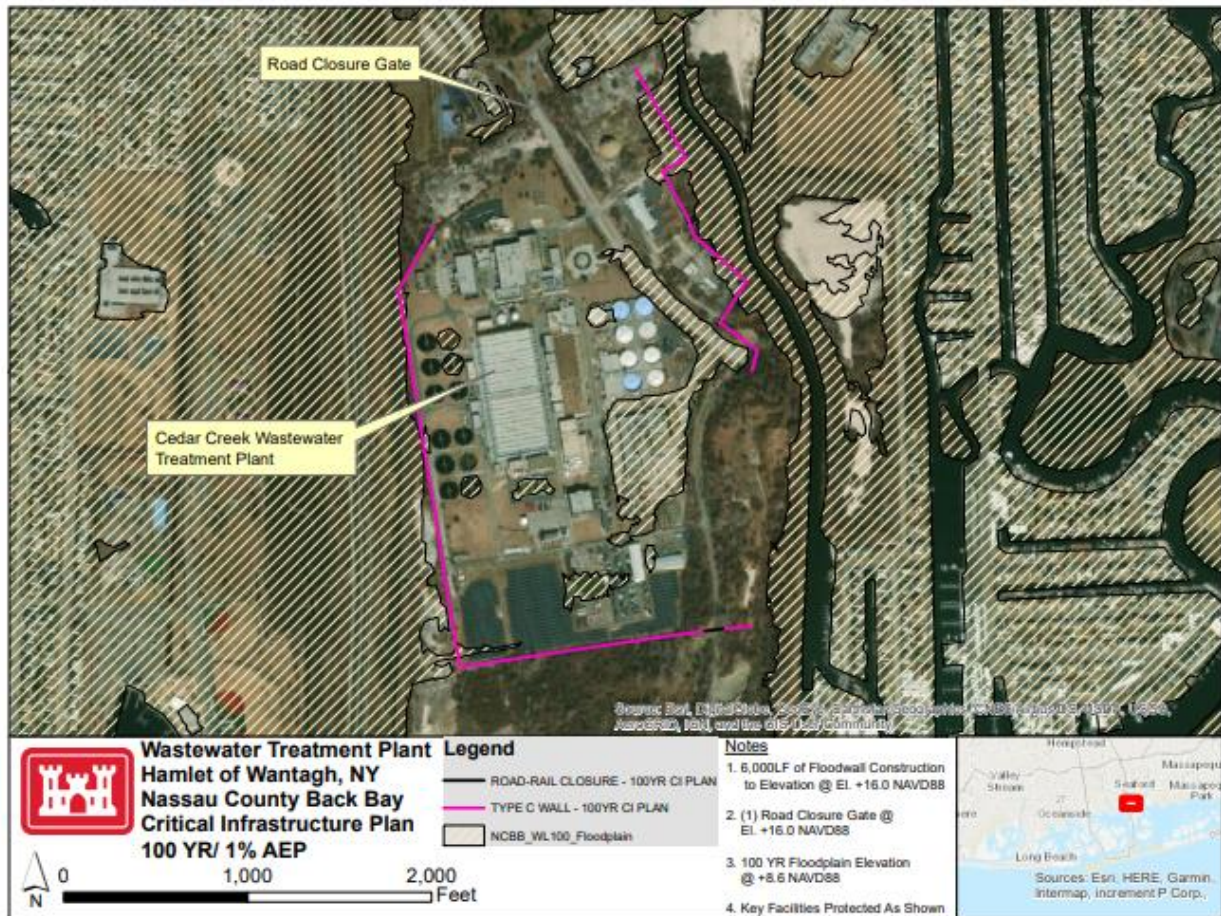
Localized Floodwall for Cedar Creek Wastewater Treatment Plant
